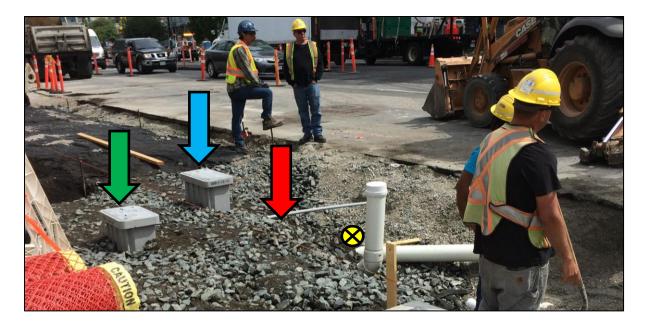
Soil sensor installation location. The yellow cross shows the approximate location where the sensors were installed. The green arrow shows the location of the valve box where the data logger was housed. The red arrow shows the 1" PVC pipe left by the CoV. Image source: GI Branch.
